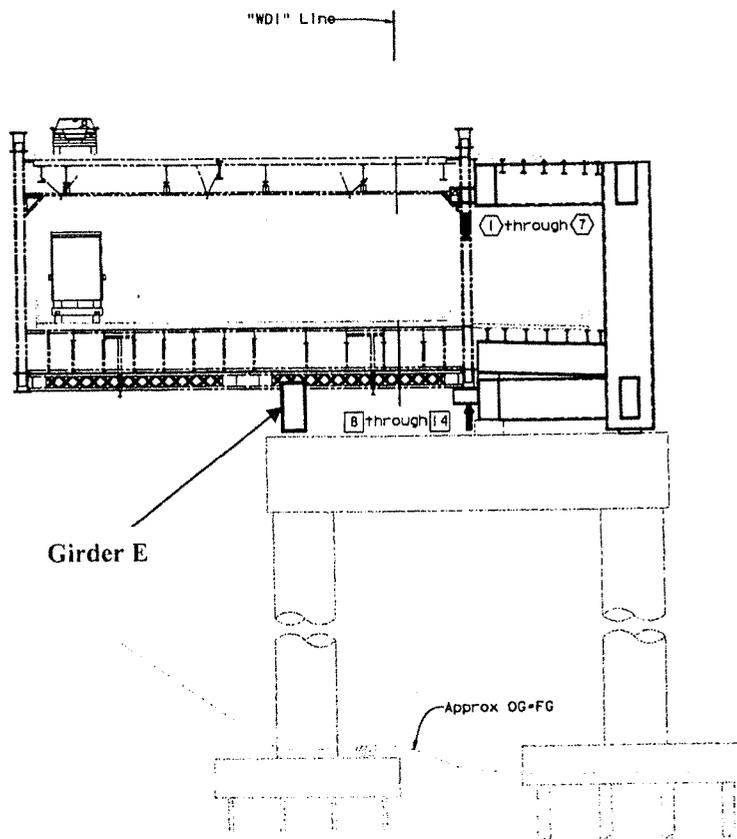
a: Load Transfer of South Segment Stage, Typical Section View
